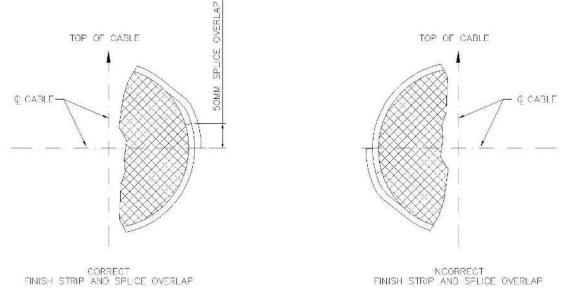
FINISH STRIP INSTALLATION AND SPLICE OVERLAP
